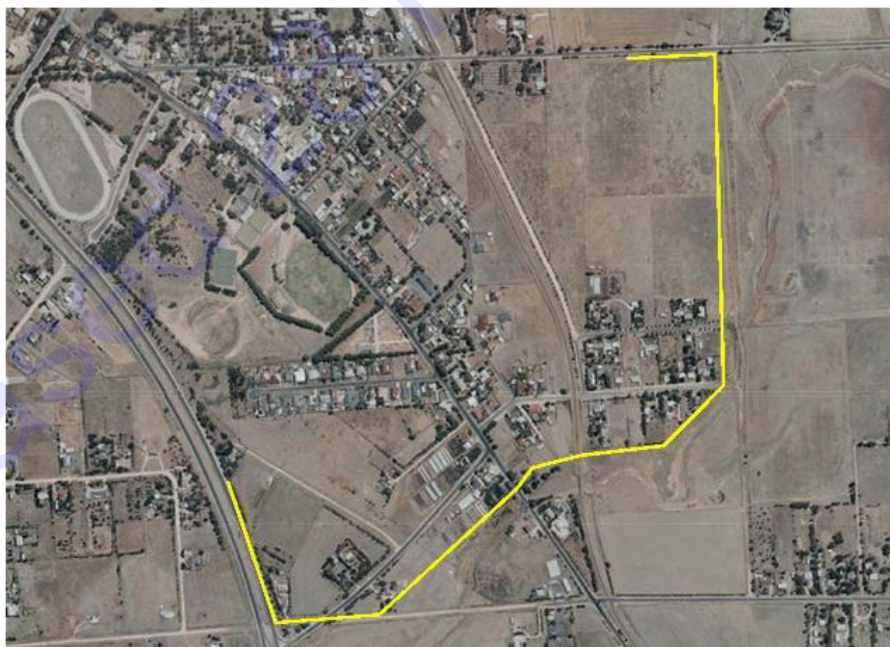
TWO WELLS SOUTHERN LEVEE LOCALITY PLAN
